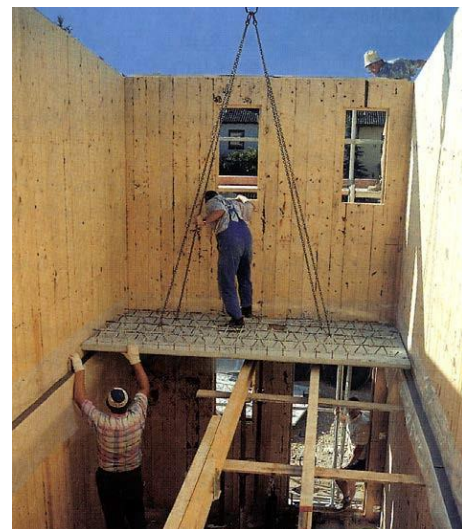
h Dickholz wood wall panels and prefabricated concrete slab [8]
